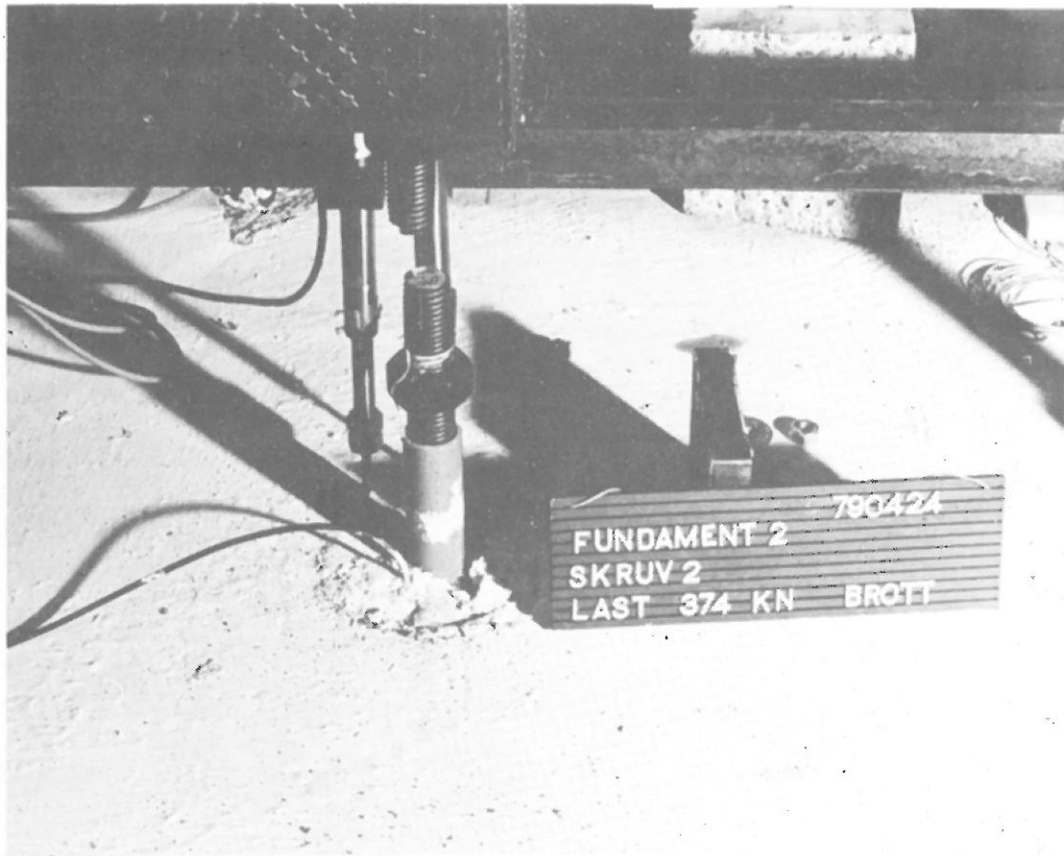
Anchor bolt SD 1:4 at failure. Drilled hole with 400 mm depth and 150 mm edge distance. Anchor bolt M27 with washer $\phi 45 \times 3$. Reinforcement $\phi 10$ Ks 400 # 200. Ultimate load 374 kN (bolt failure)
